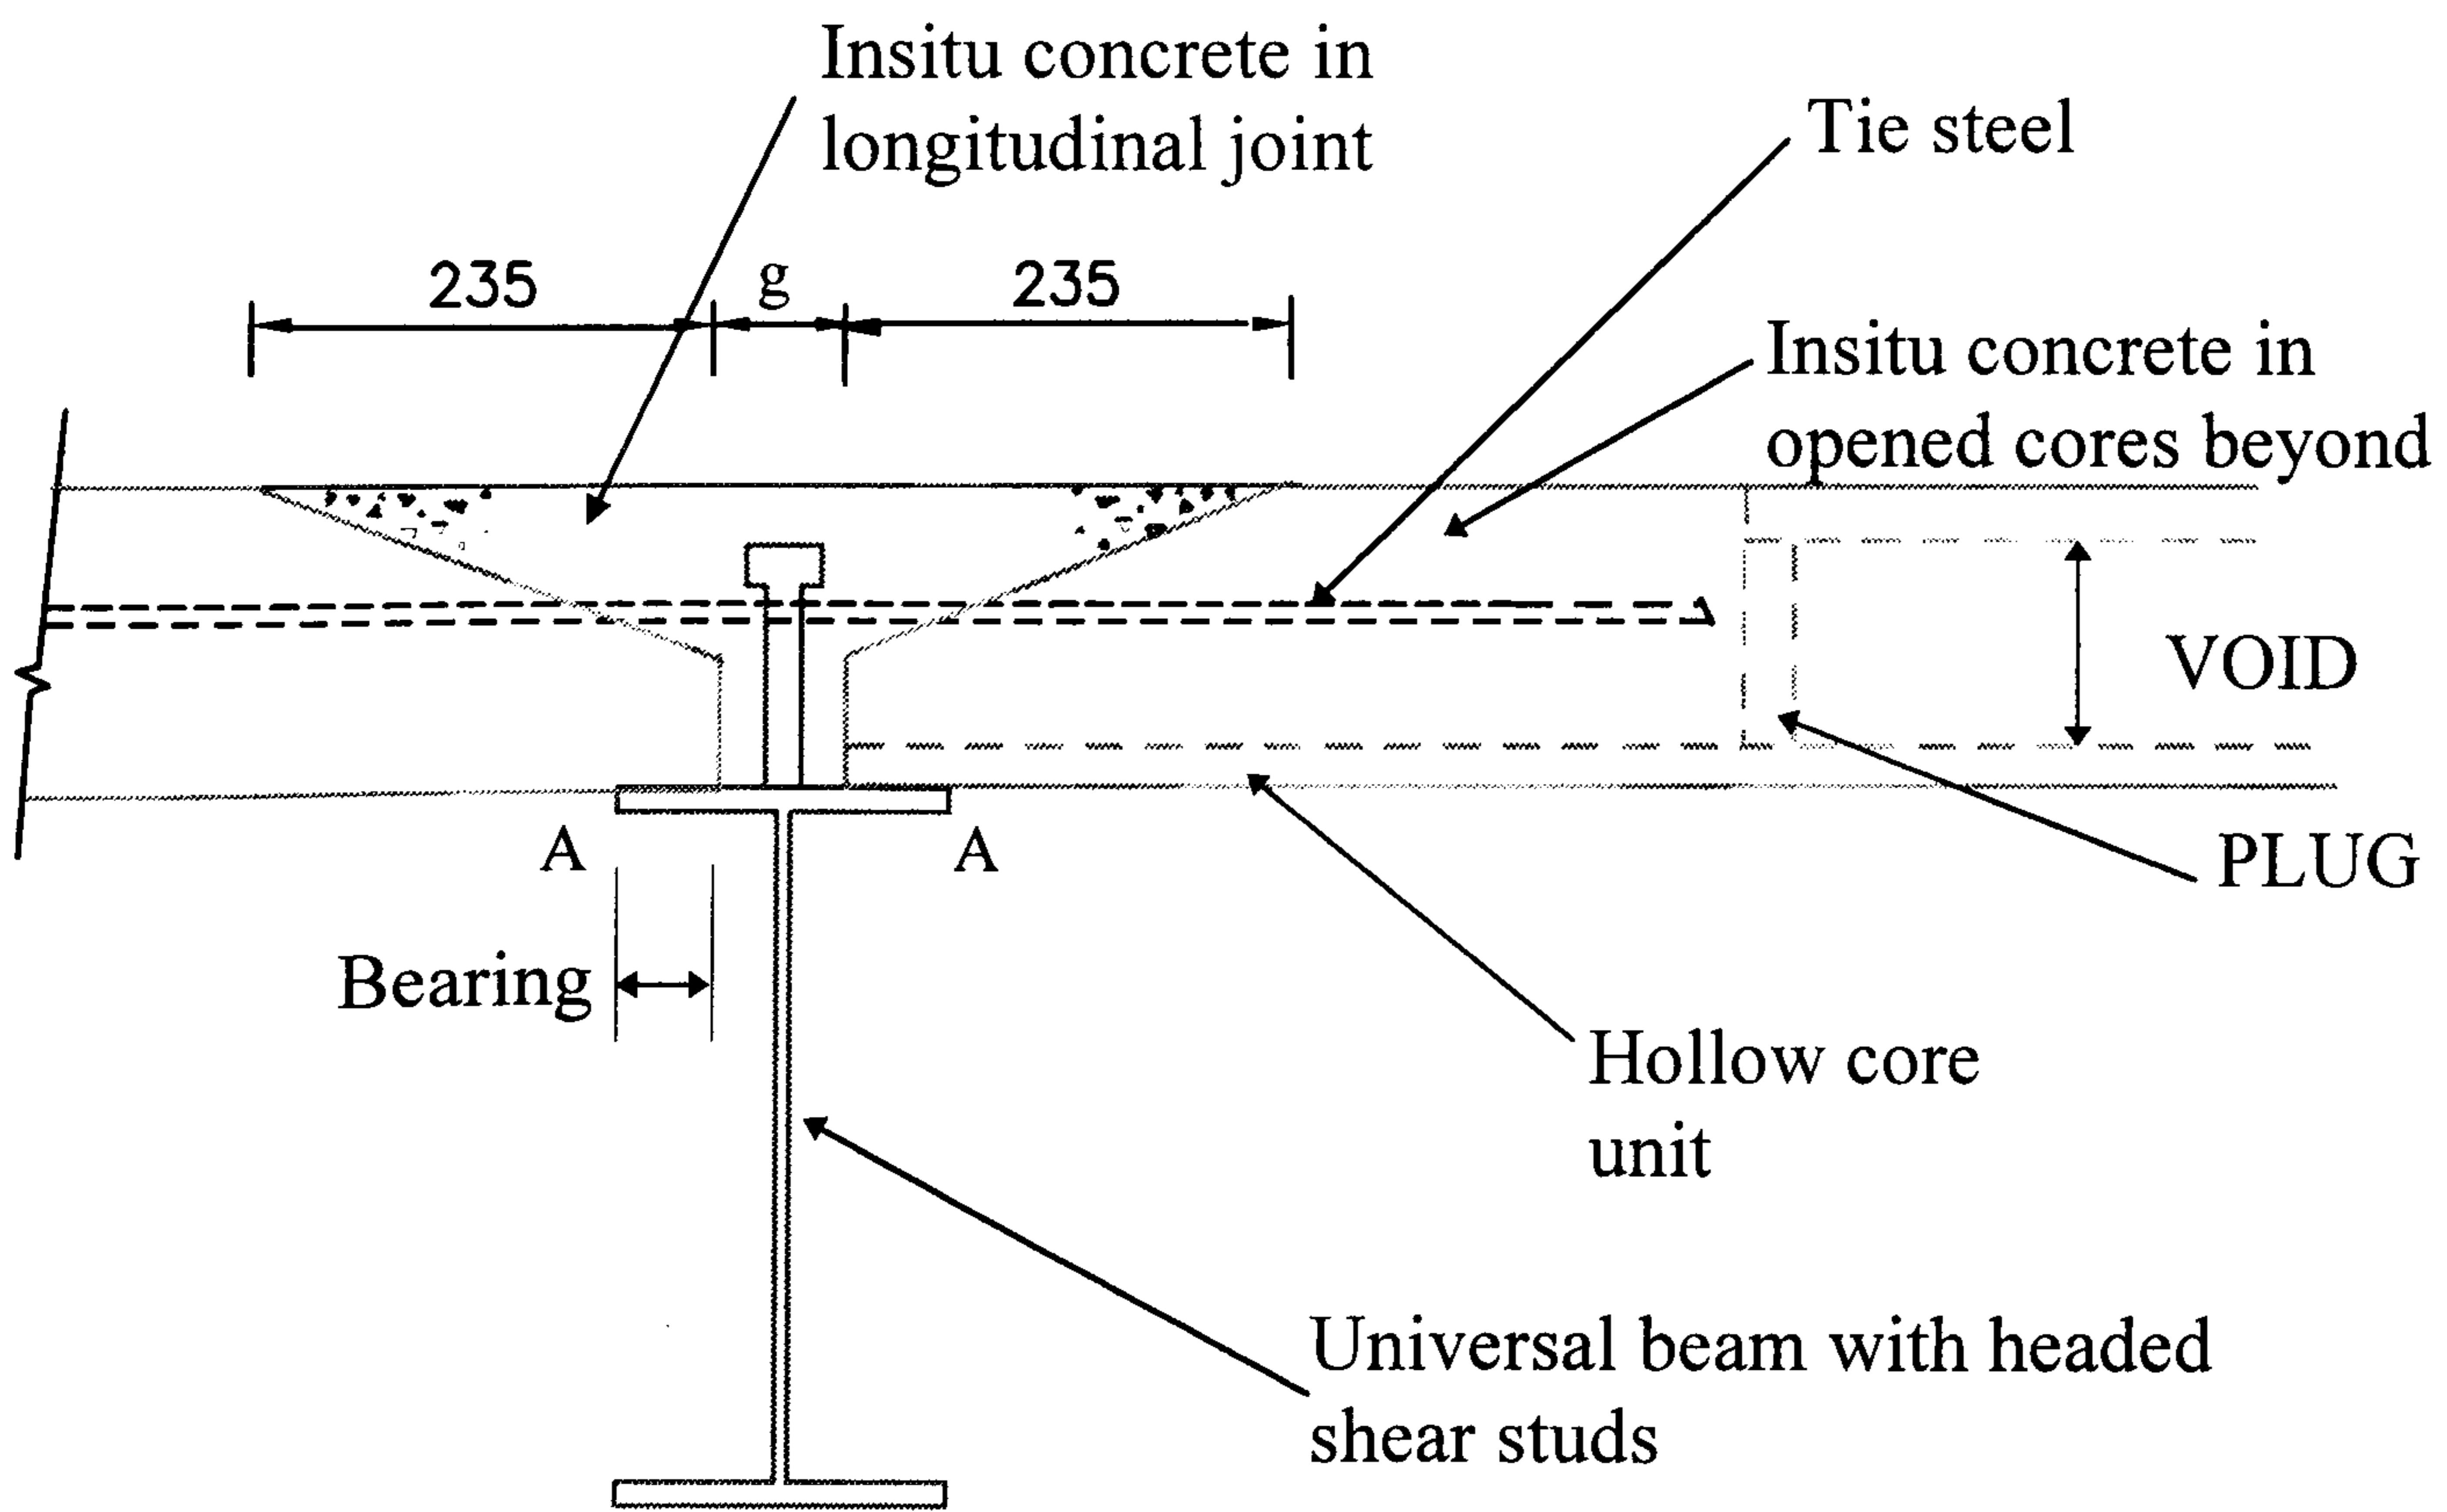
Details of the precast-insitu joint of composite beam with hollow core unit
